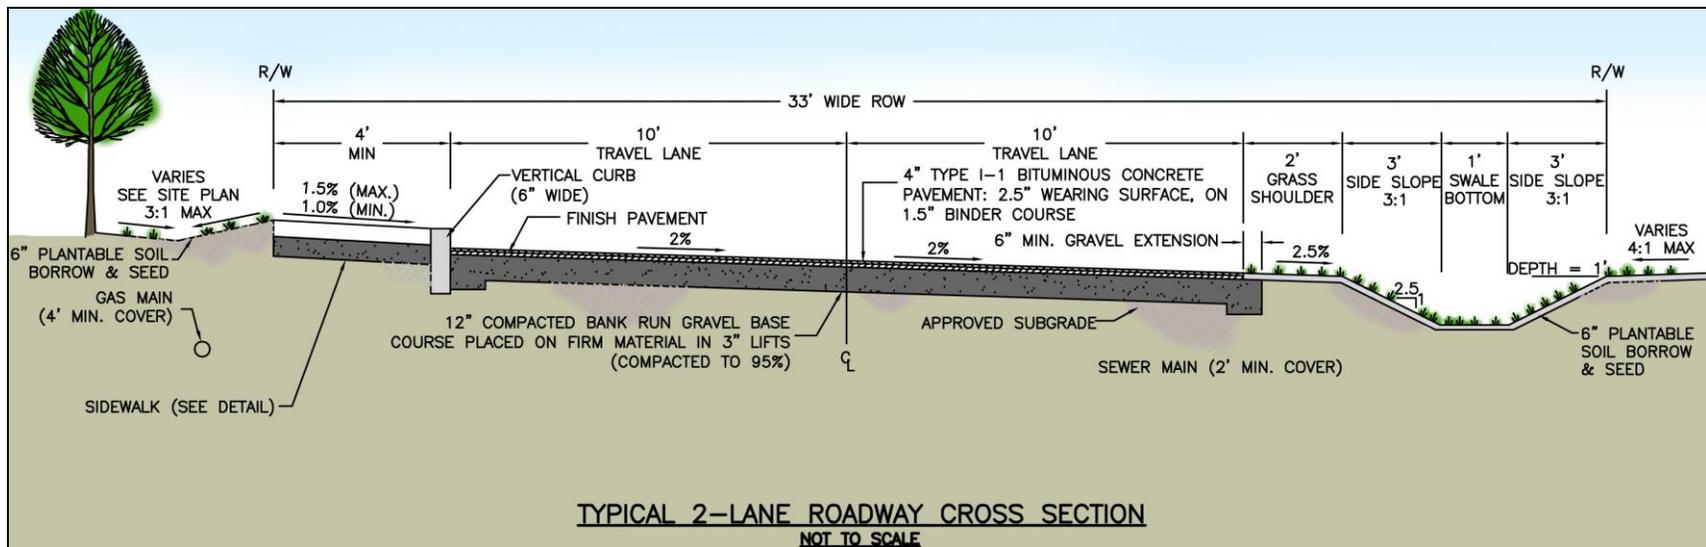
Example of Roadway Cross-Section Detail Depicting Open Channel on One Side of Road (HW, 2009)
